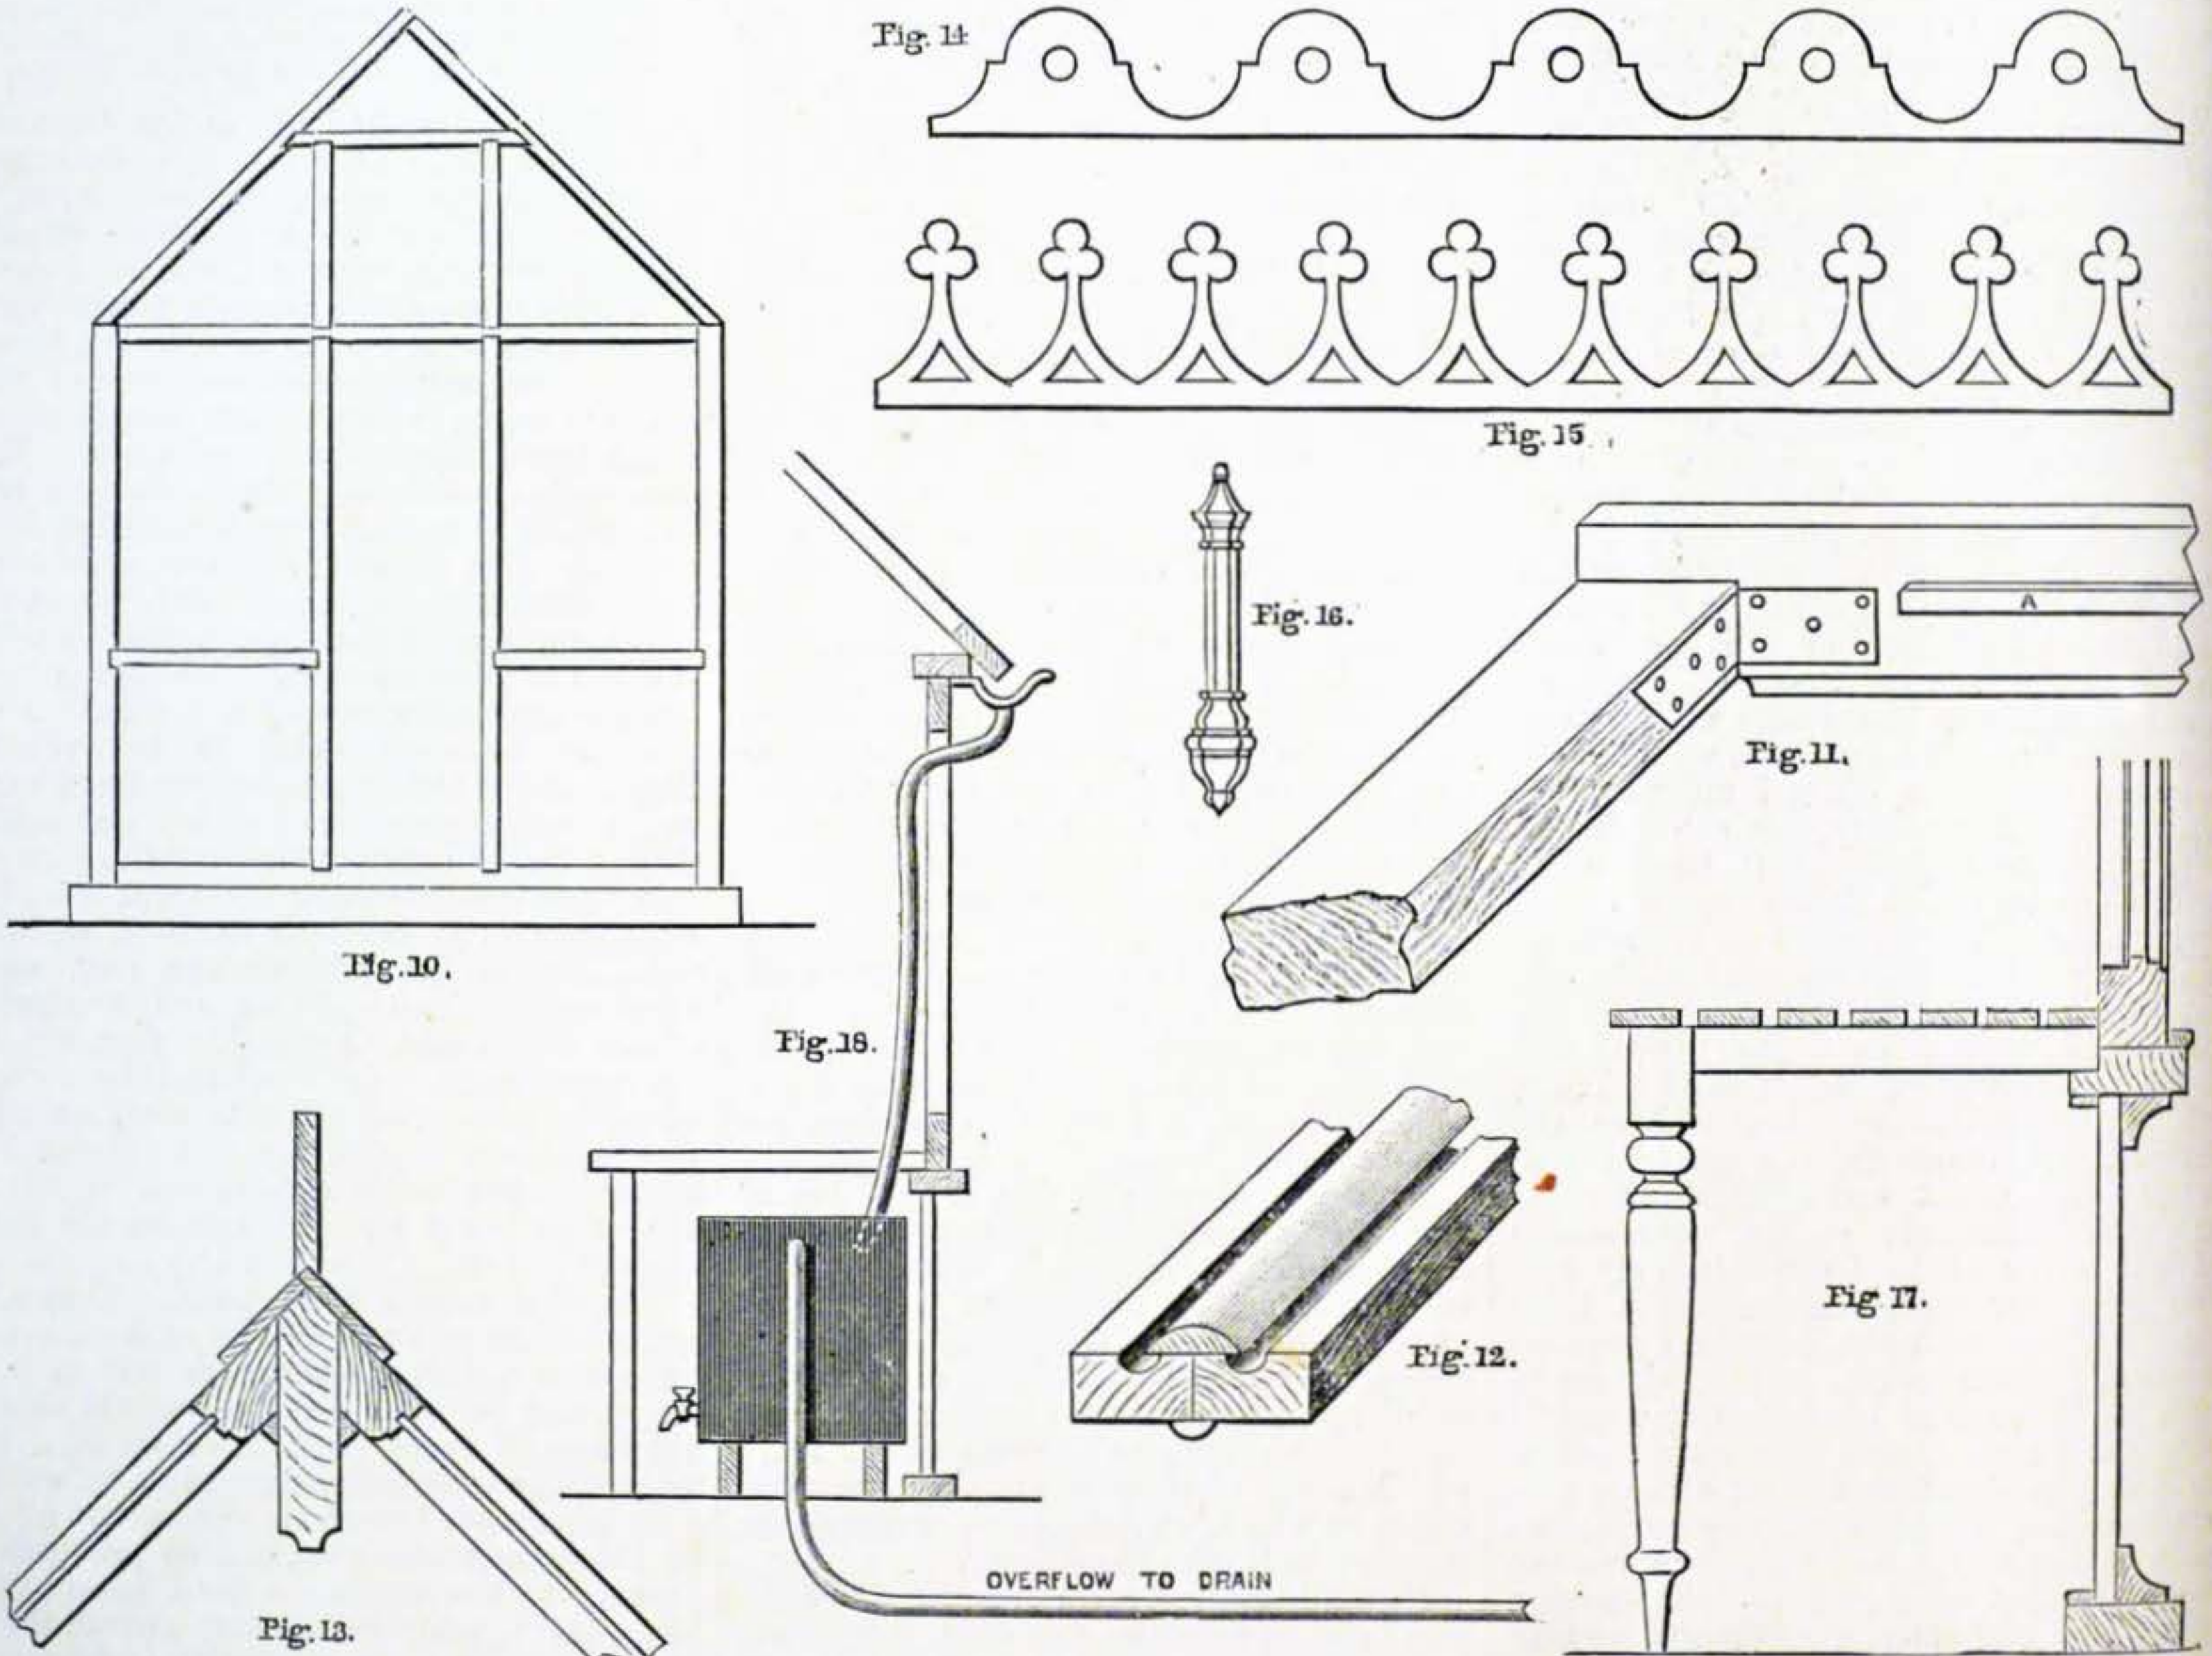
Elevation of Framing of Front End. Fig. 11.—Mode of Putting on Ridge Board. Fig. 12.—Details of Joint of Roof Sashes. Fig. 13.—Details of Ridge in Section. Fig. 14.—Cut-out Ridge Board. Fig. 15.—Alternative ditto. Fig. 16.—Octagonal Finial for End of Ridge. Fig. 17.—Details of Inside Shelves. Fig. 18.—Section showing Cistern for Rain-water with Mode of Collecting and Disposing of Overflow.
